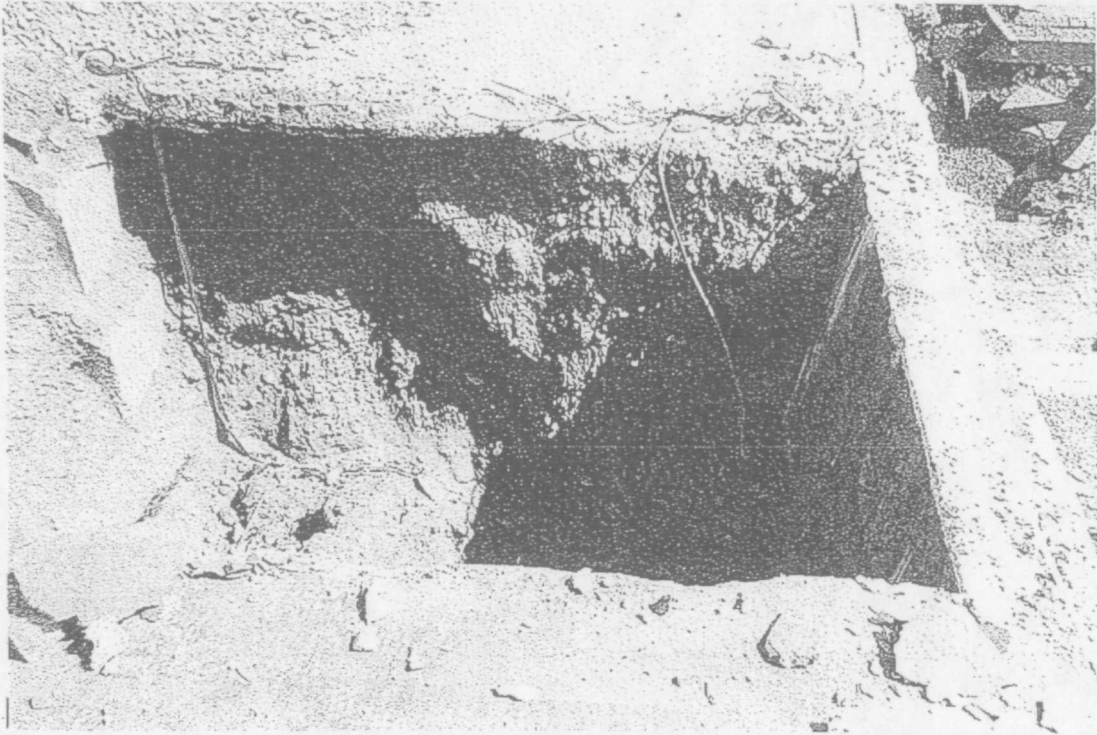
Shoring piles (typical of 9) vibrated 25 feet below ground surface along Front Avenue.
